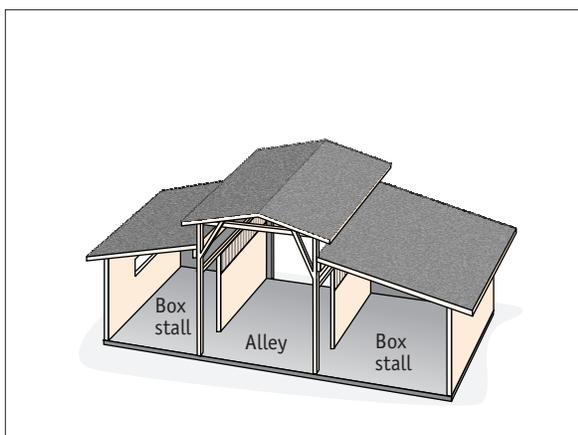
Monitor roof. Two rows of stalls serviced from center alley. (post and beam).
